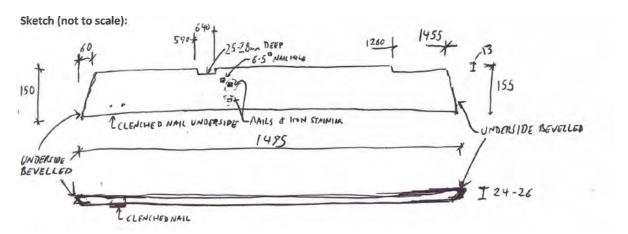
Working drawing of Element (084) noting bevelled edge, notch and clenched nail.
